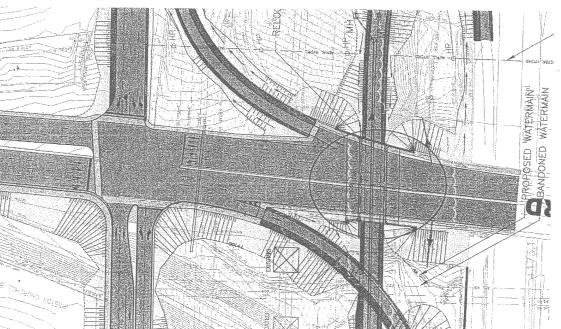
Staging Plans for 403-Eastgate Exit Ramp and Structure
